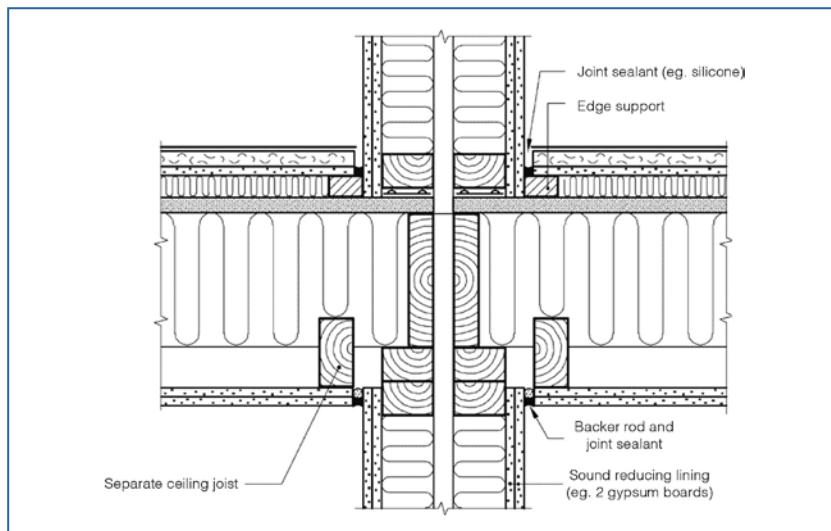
Generic detail showing typical separating wall and floor and the junction between them in terraced housing [[2] - (Norway)].
